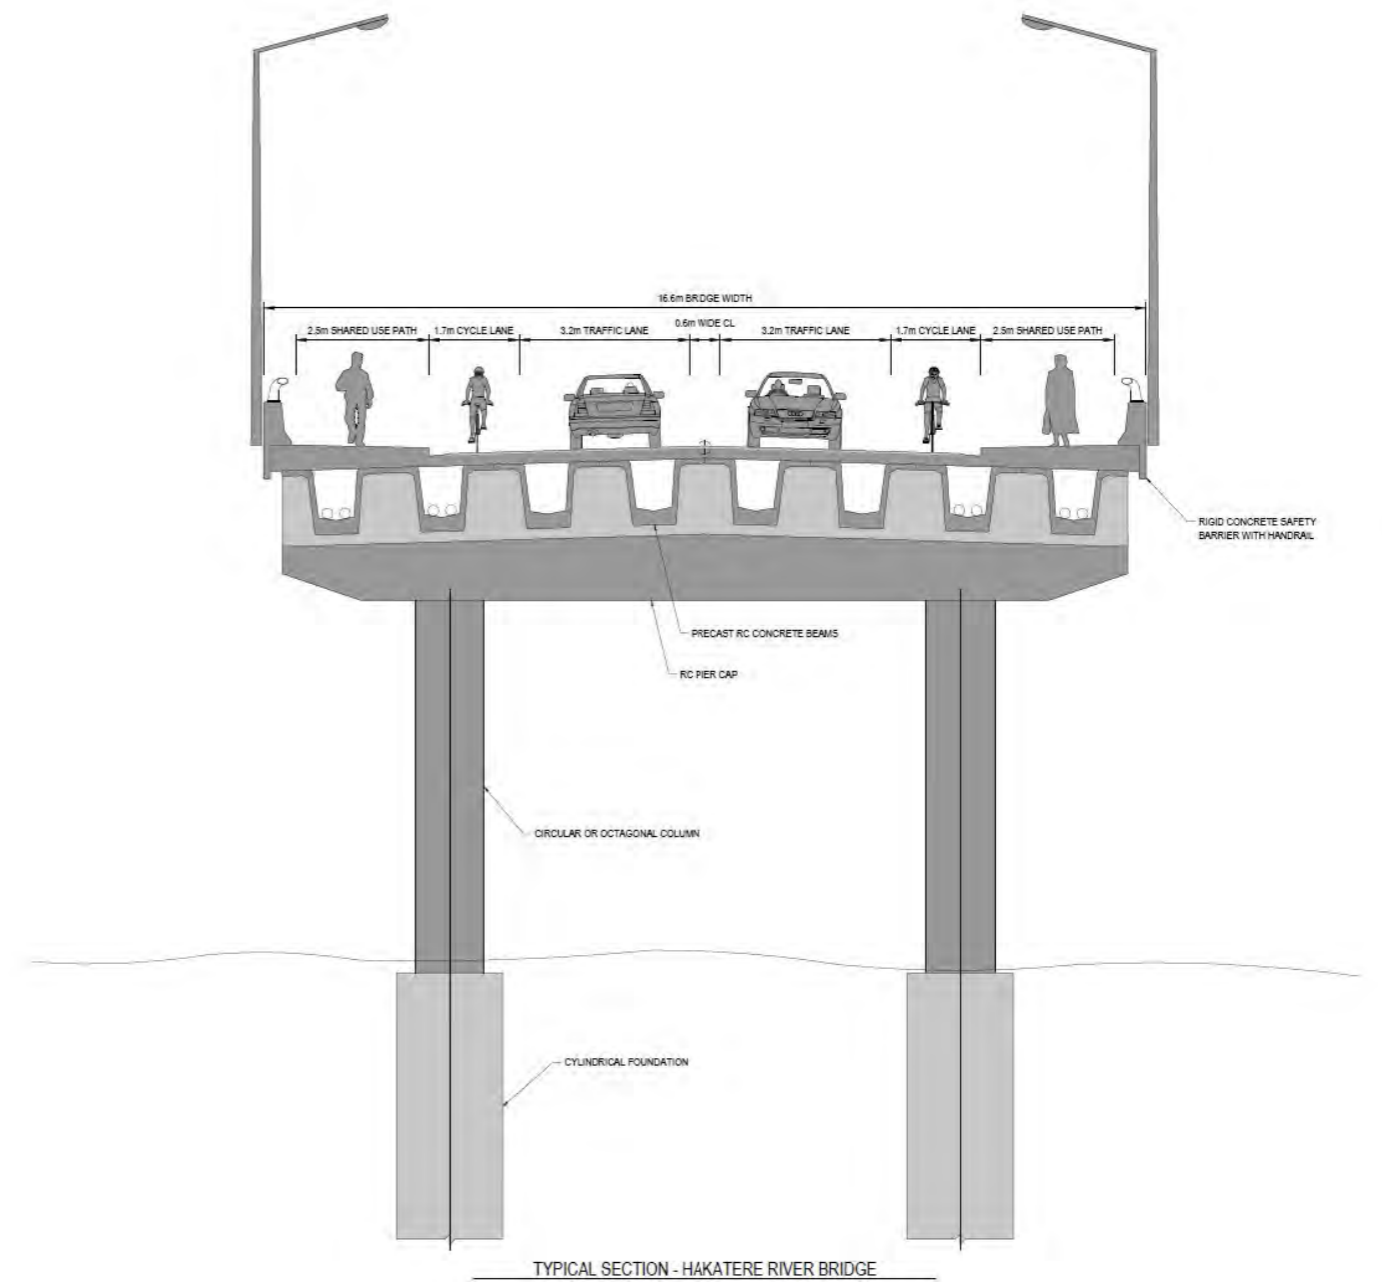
Bridge Typical Cross Section for the Ashburton River / Hakatere crossing
